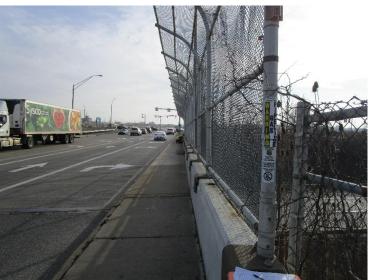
View looking south at the west side of the bridge. Samples taken from parapet railing joint caulking.
